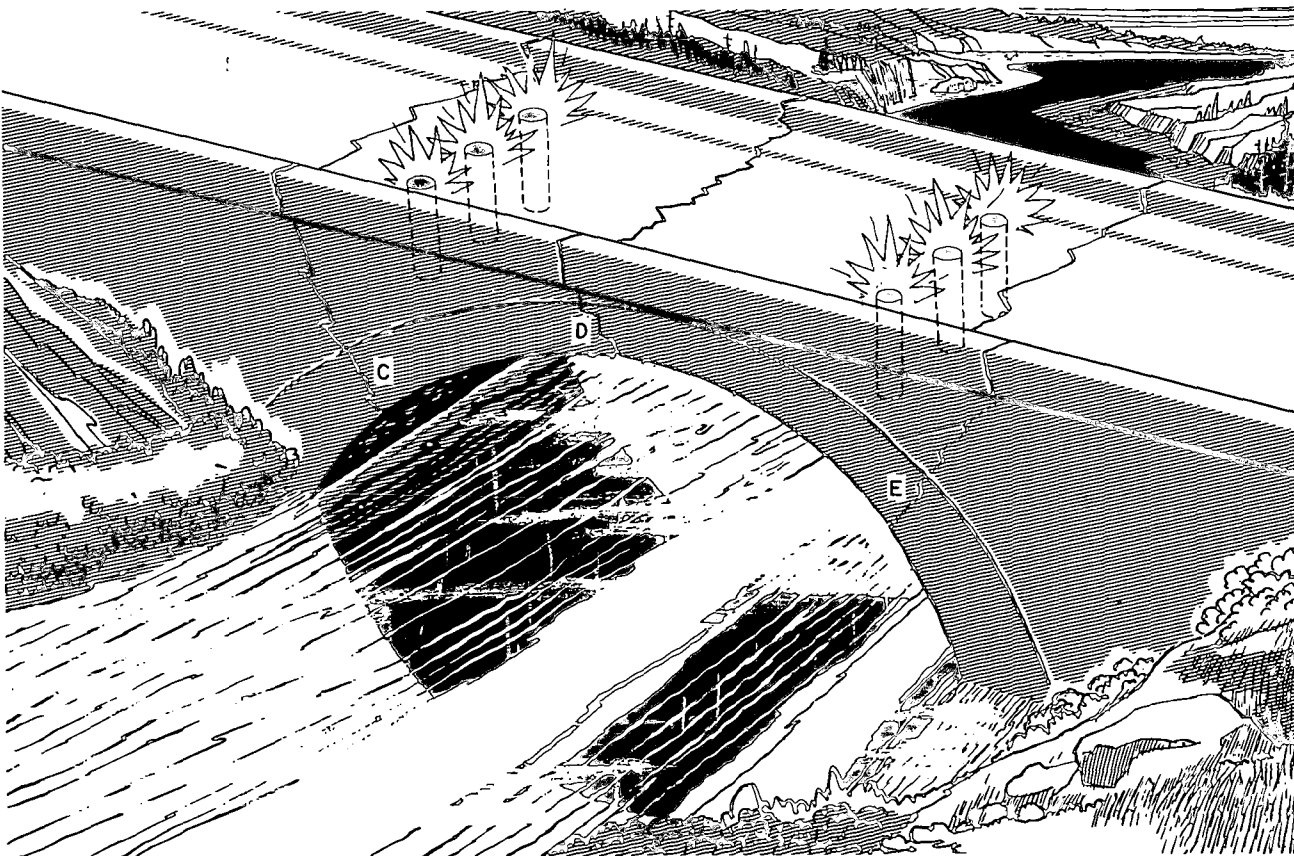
Breaching by haunch charges on filled spandrel arch bridge.
